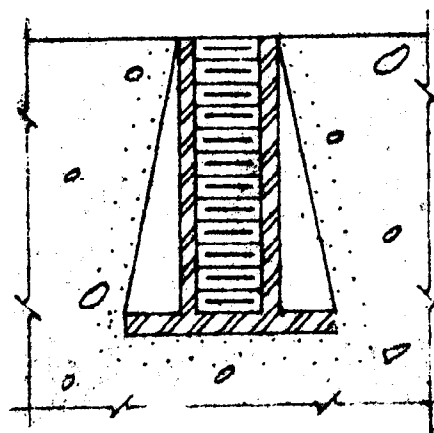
Detail drawings of section D-D, and for bolt inserts and holes.
